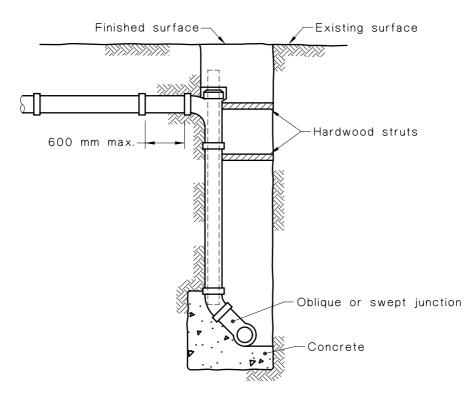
VERTICAL JUMP-UP TO BRANCH SITE STORMWATER DRAIN
